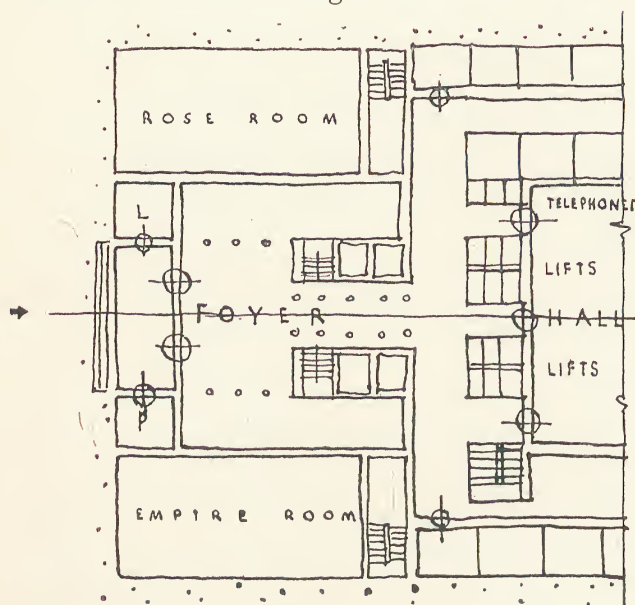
ILLUSTRATING AMERICAN TYPE OF ENTRANCE, WITH LARGE FOYER EXTENDING OVER GREATER PART OF GROUND FLOOR
